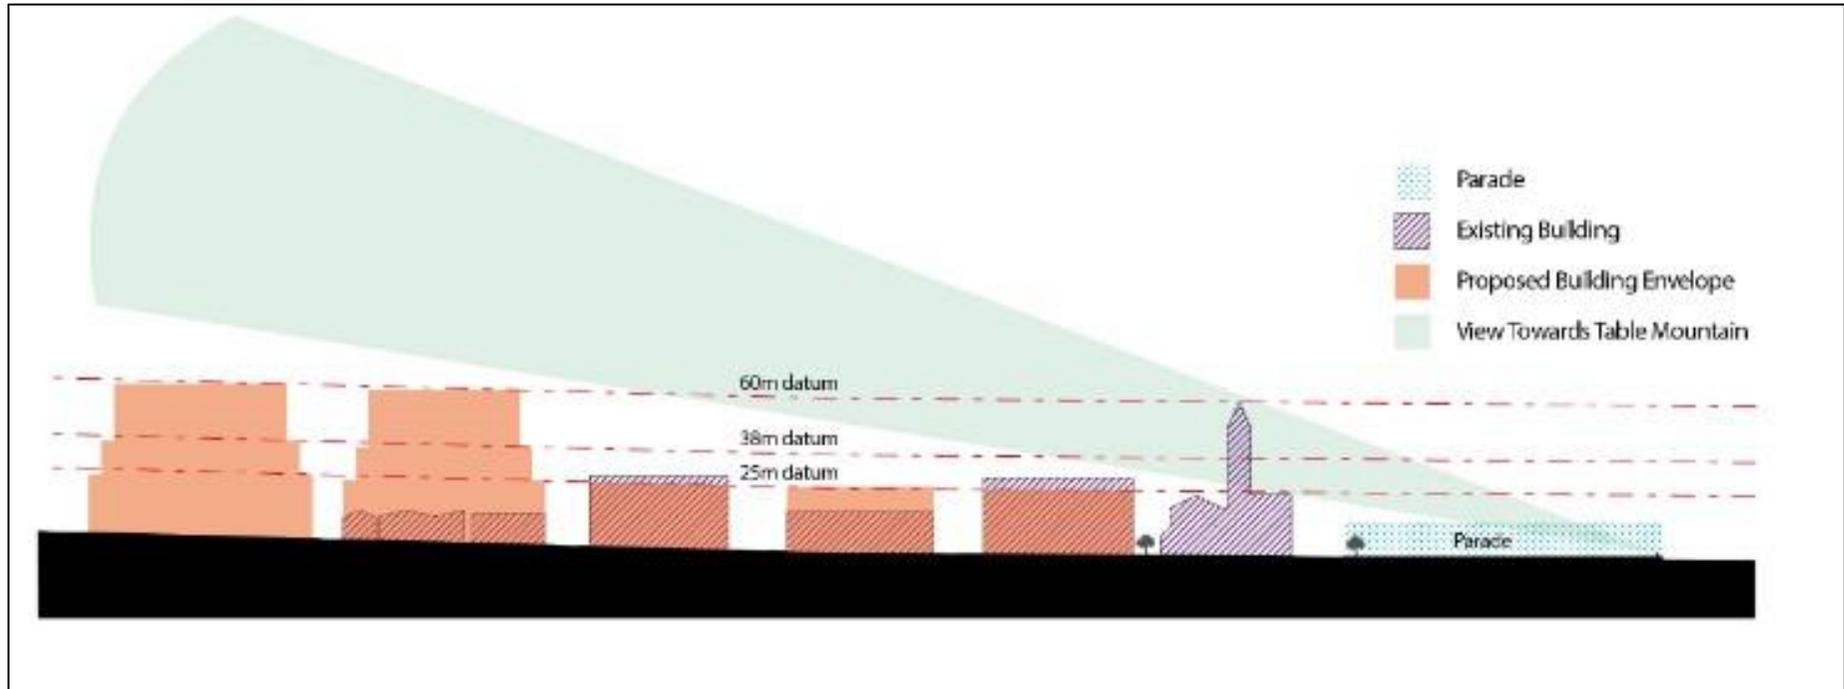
Section through Grand Parade showing impact of potential building scale on significant view
